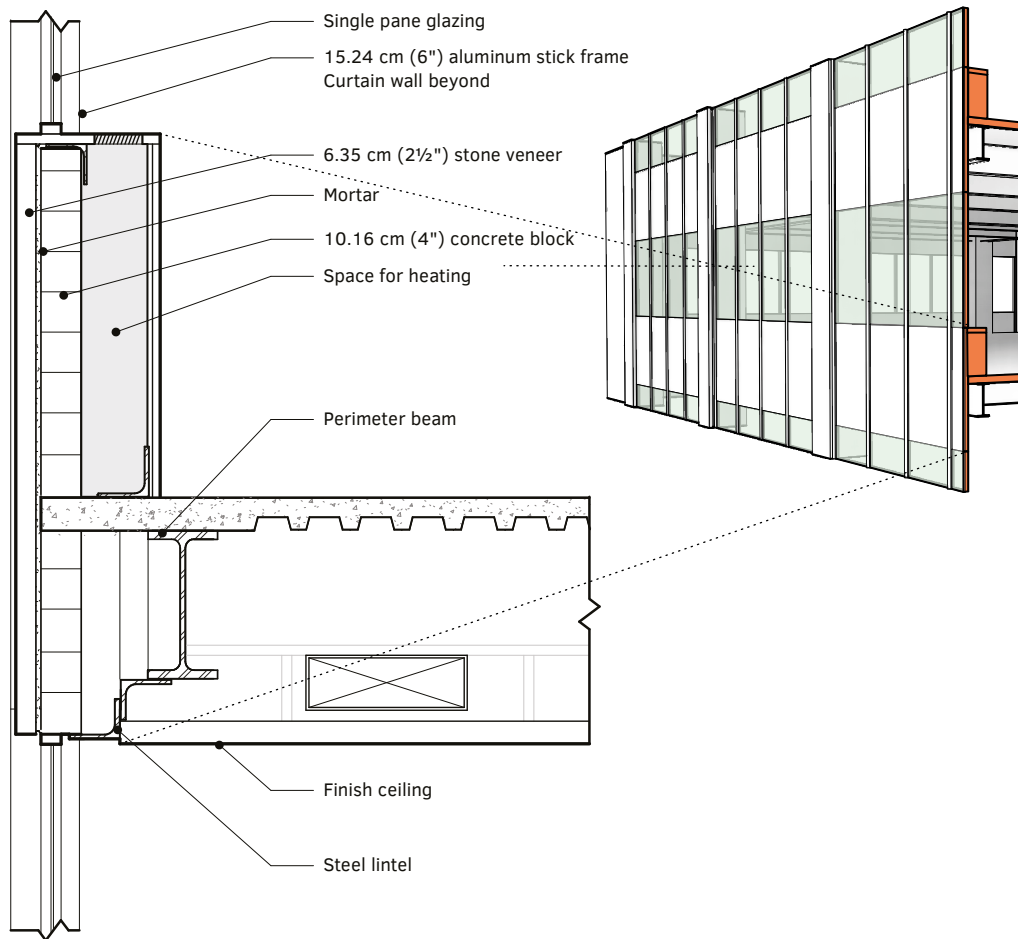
Existing Assembly of the Howe Center building envelope as typical of office buildings of this vintage.
